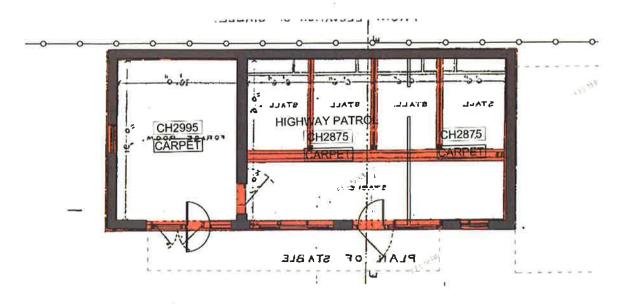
Overlay of original 1884 floor plan of stable (shown red) with the current floor plan of building (shown black). Physical evidence indicates that the stables were built in reverse of the original plan, but in all other aspects are consistent. The horse stalls have been removed and the openings in the front wall substantially altered to convert the building firstly to a garage and then later to offices. (Source: NSW Government Architects Office Archives and Brookfield Global Integrated Solutions, 2016)
